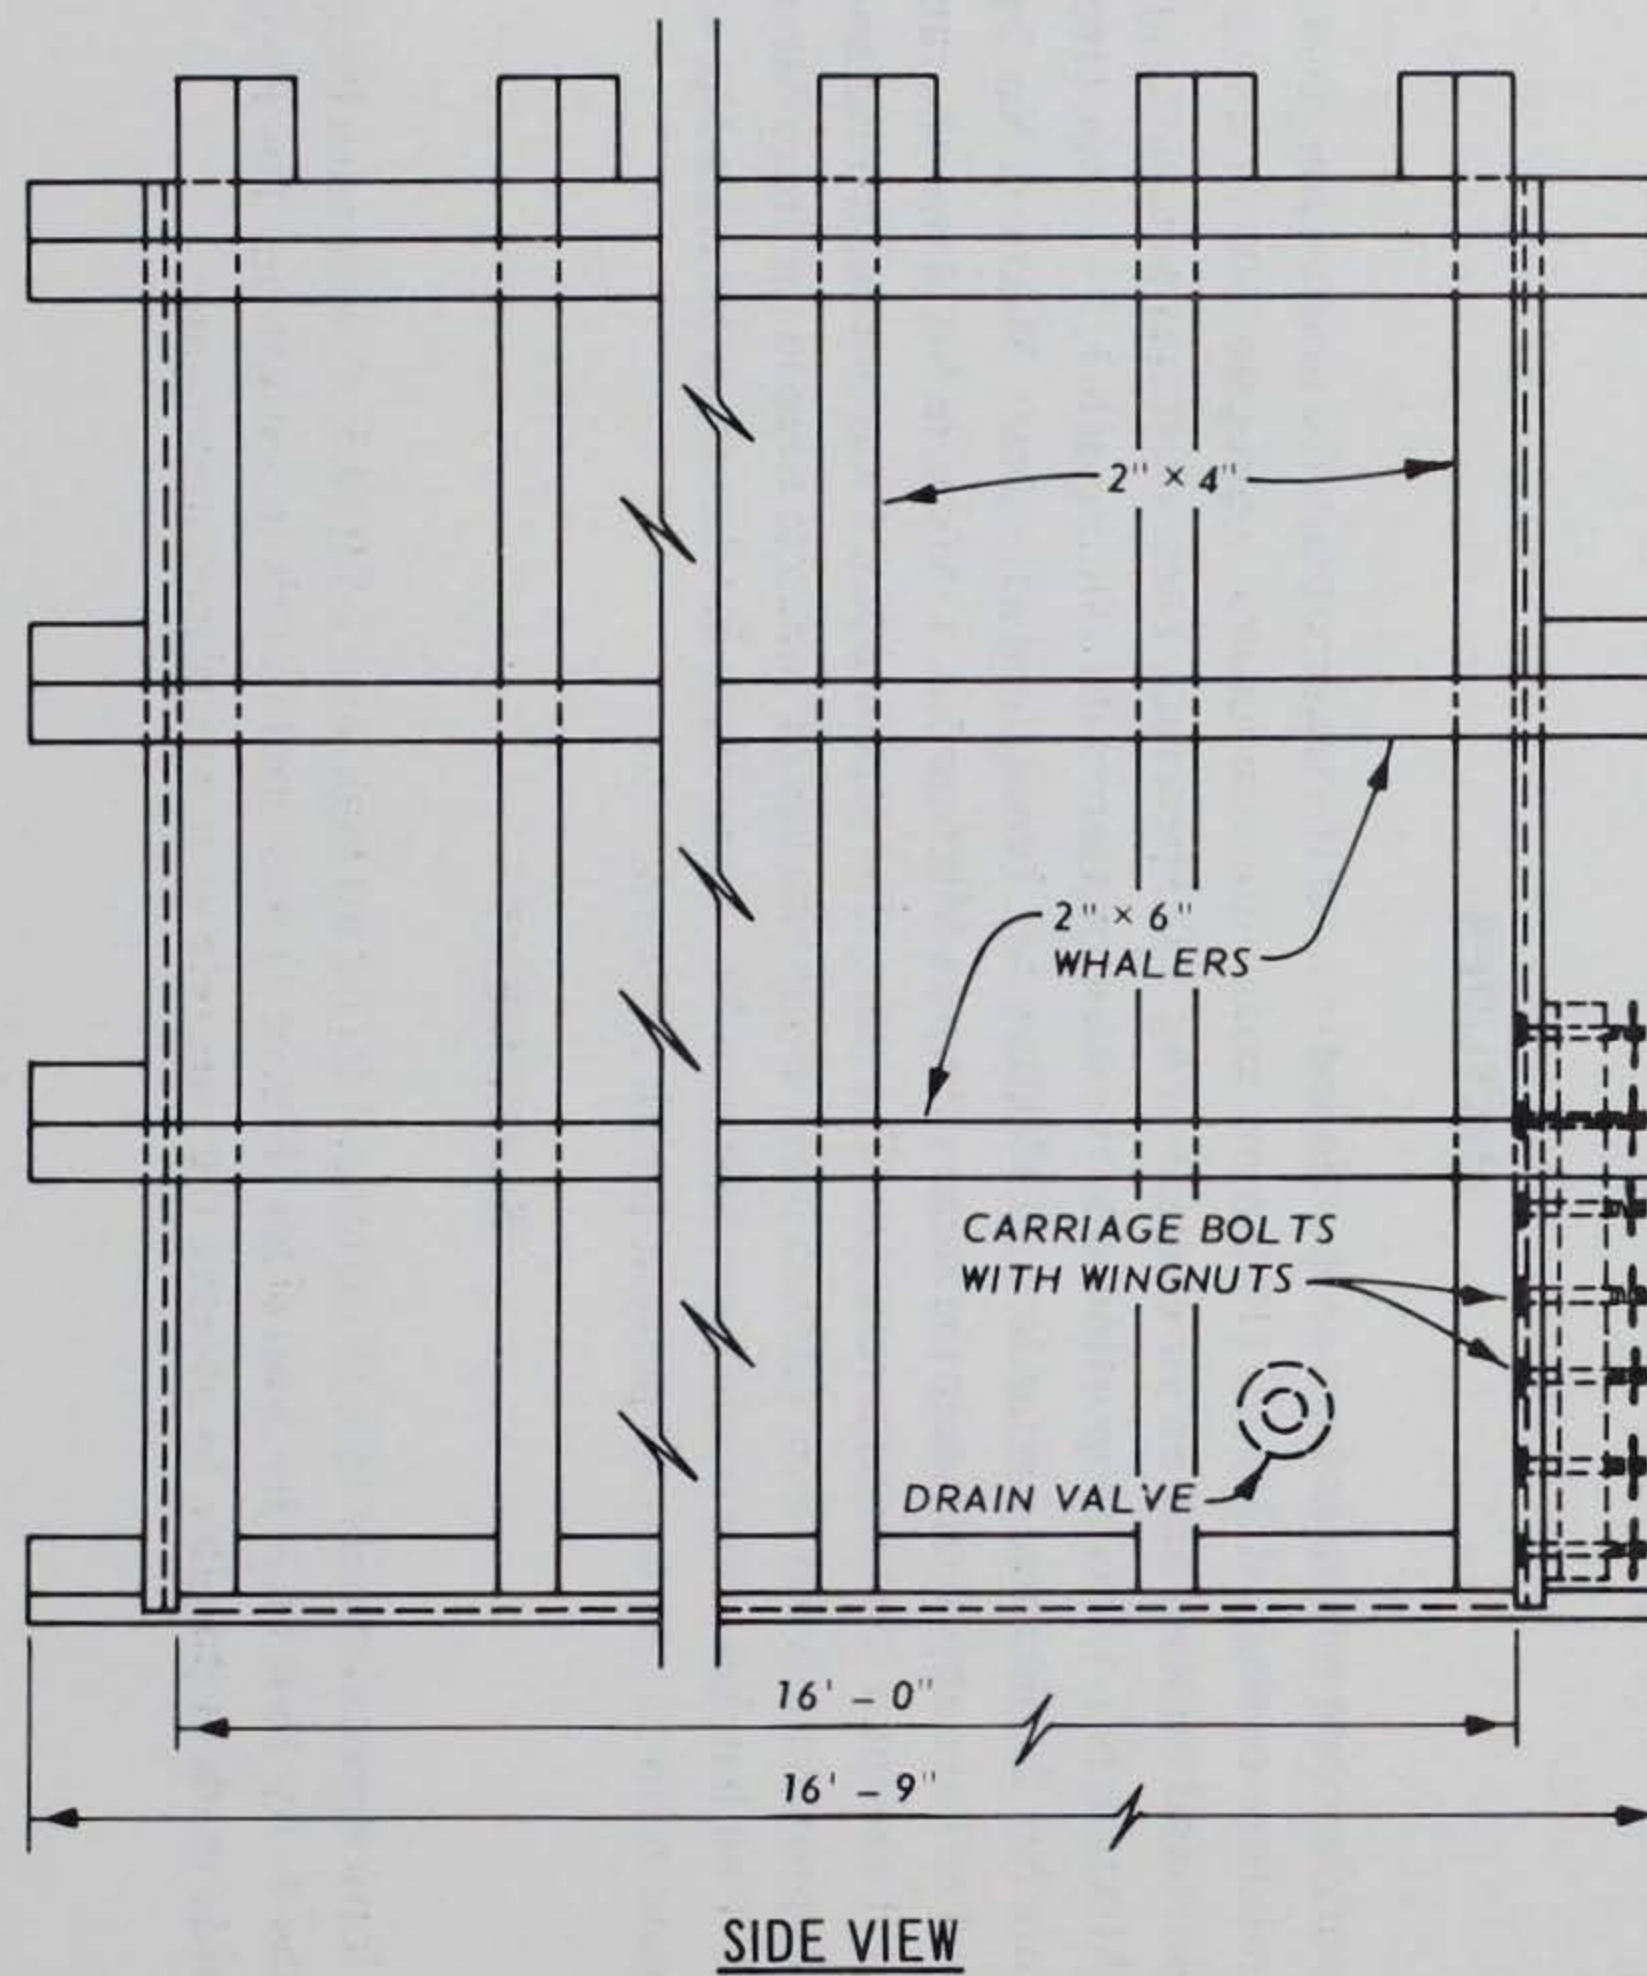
Sketch of Plexiglas form used to observe tremie concrete
